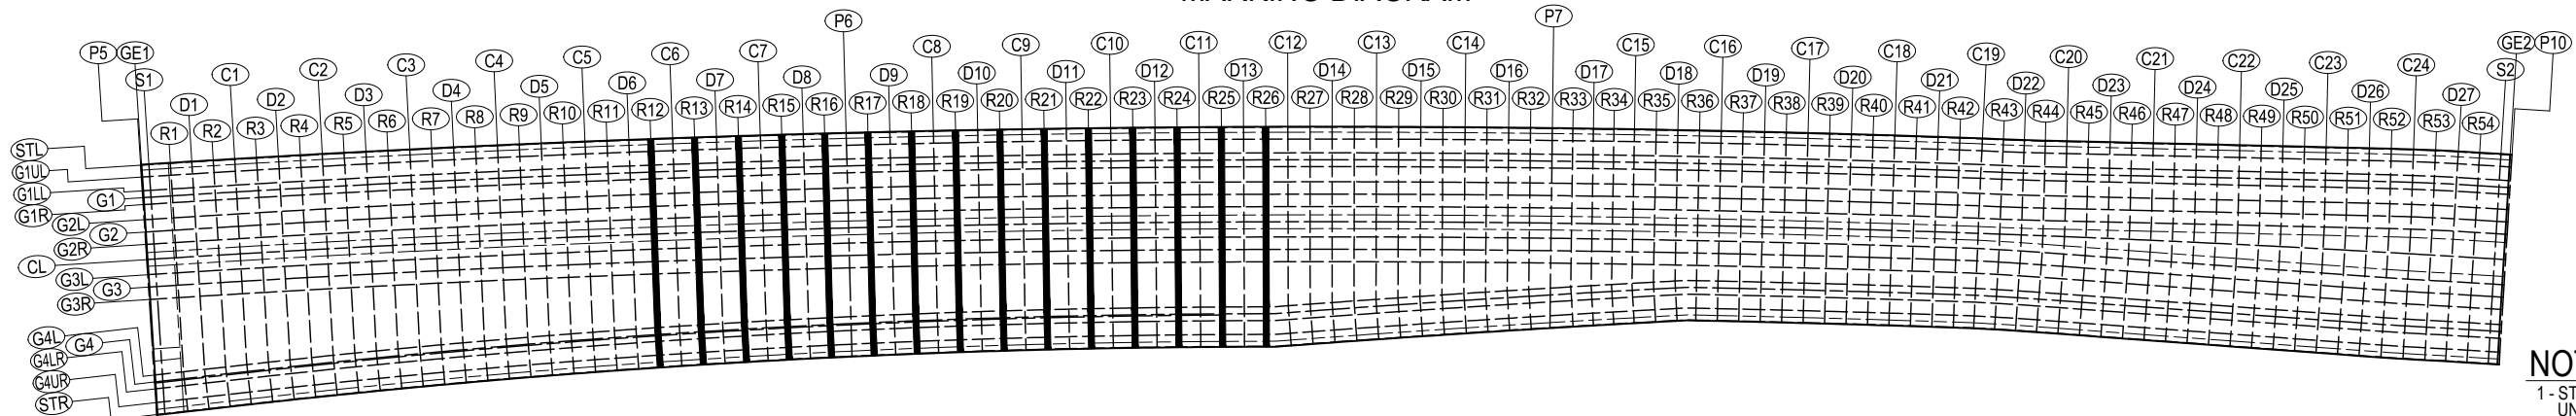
DETAIL OF CROSS BEAM SECTION (6) S=1:60 R12 TO R26 (2)
